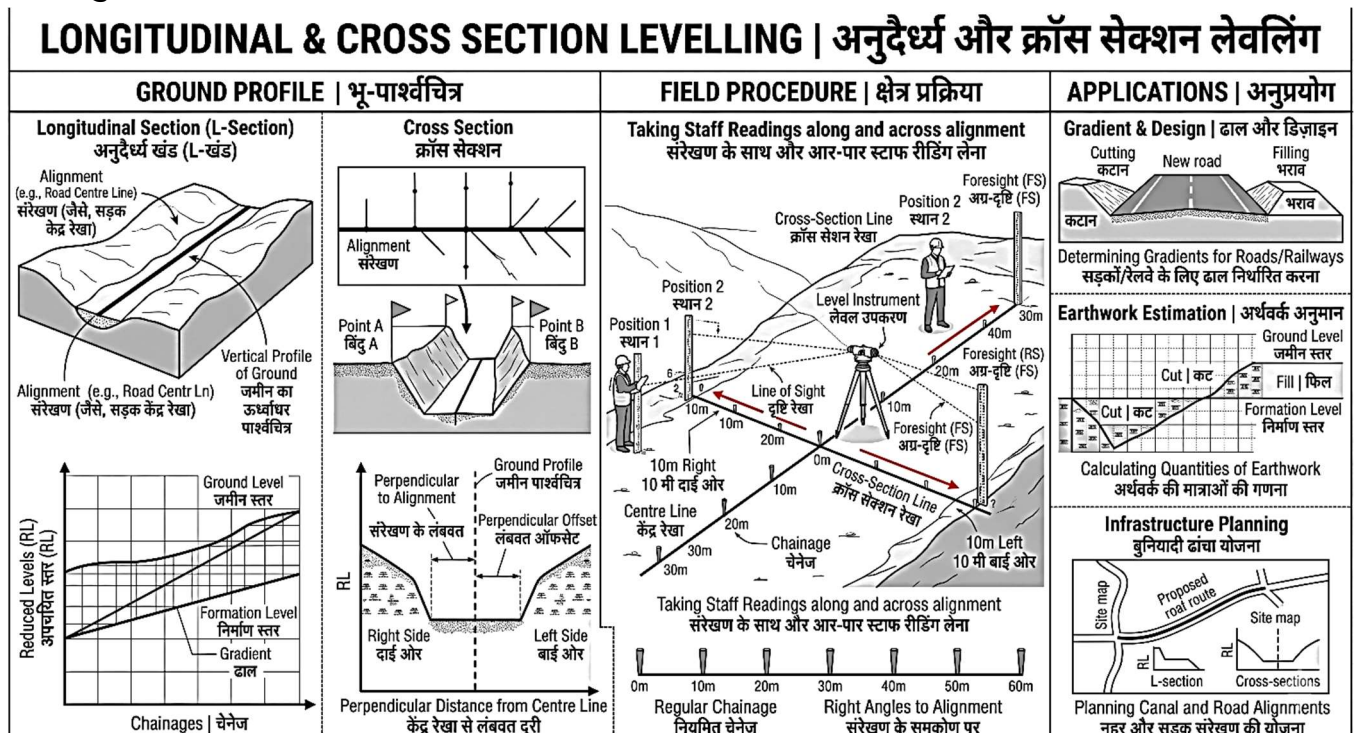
Longitudinal and Cross Section Levelling—Procedure and Applications | अनुदैर्घ्य एवं क्रॉस सेक्शन लेवलिंग—प्रक्रिया एवं अनुप्रयोग
